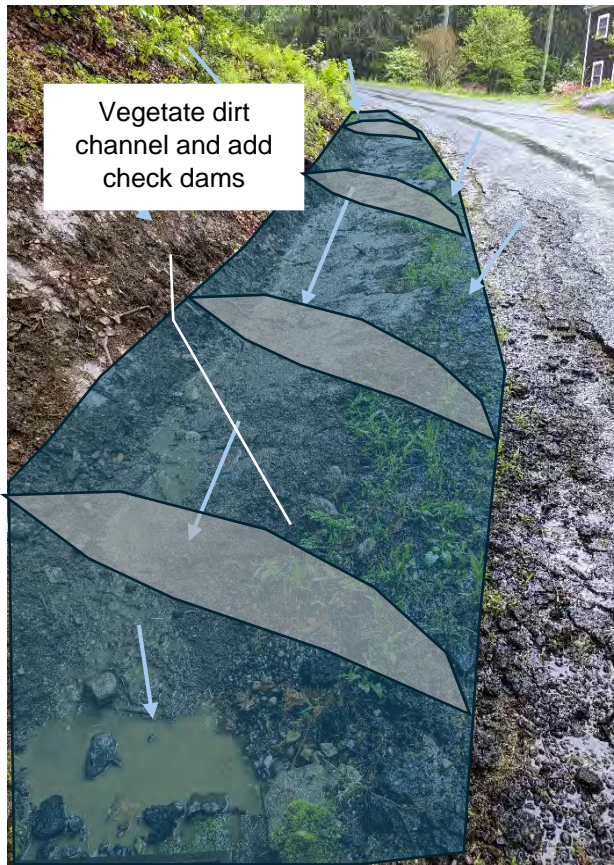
Sediment laden runoff and erosion along the existing ditch
